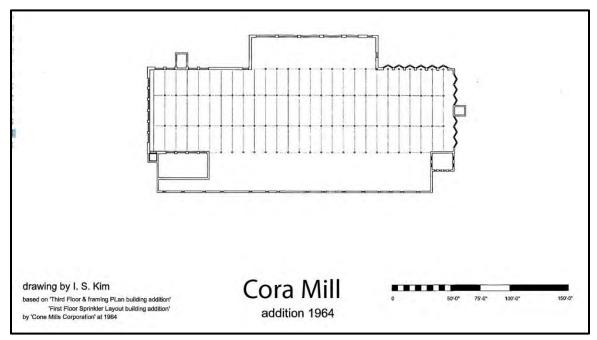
Plan drawing of Cora Mill with mid-twentieth century alterations. Note loss of the Praray-design walls on the east and north elevations.
